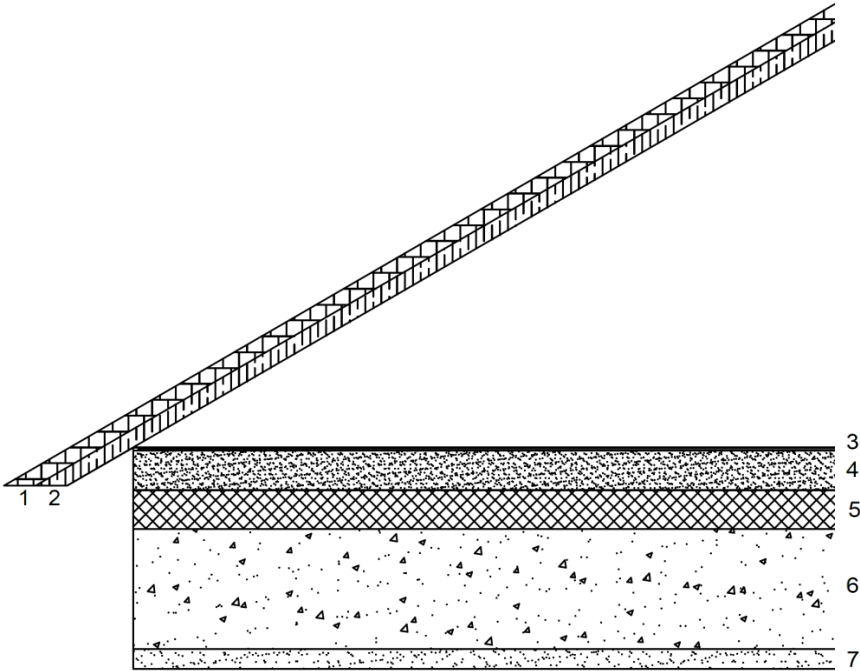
Typical topology detail of an insulated horizontal concrete and inclined clay tile roof
